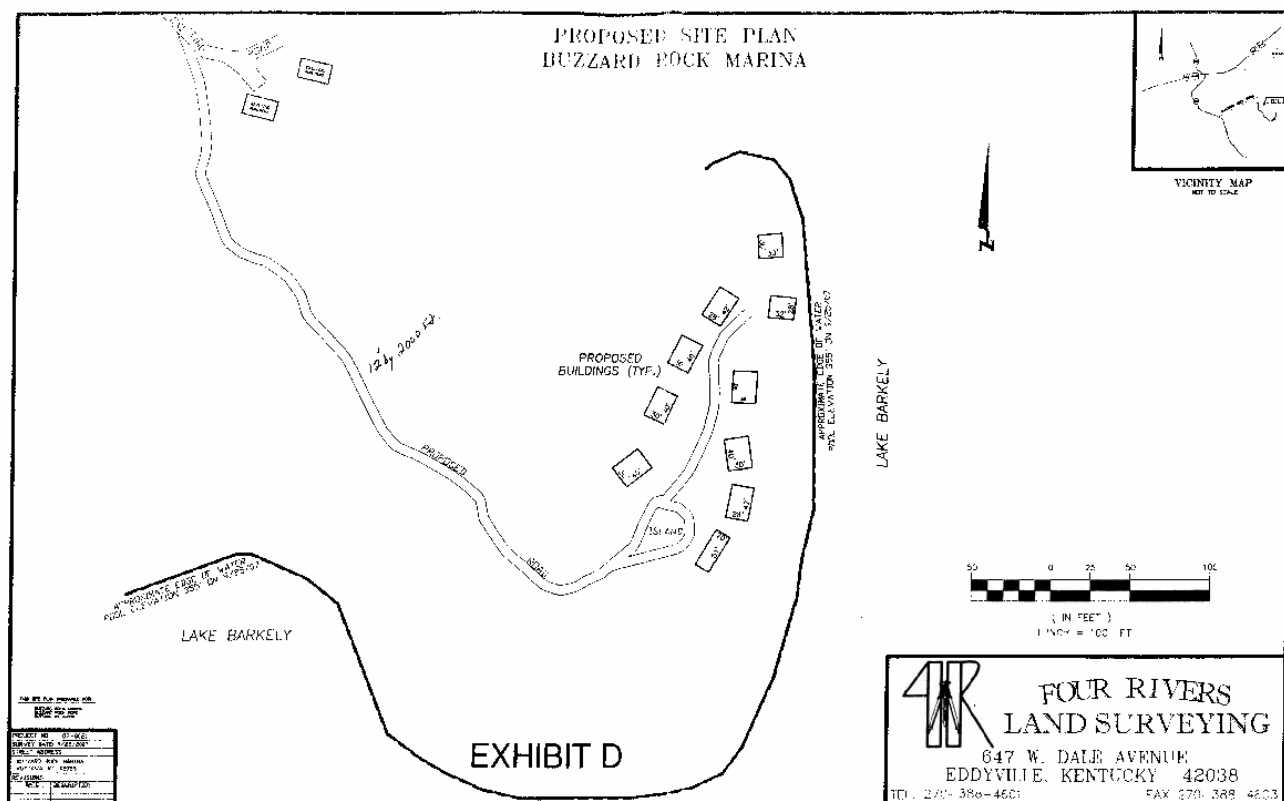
Buzzard Rock Resort and Marina - Proposed Site Plan
